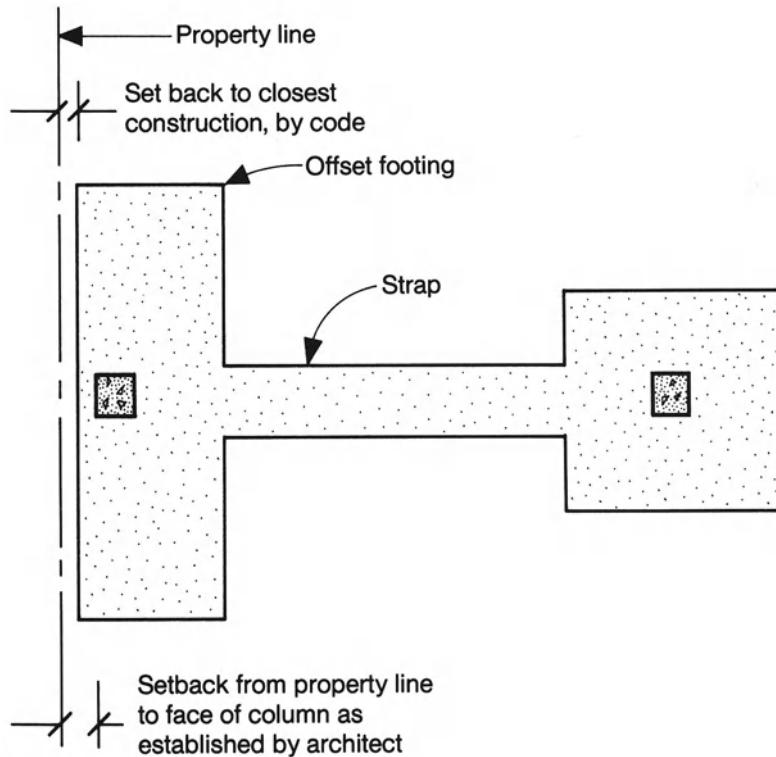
Strap footing solution to problem of column positioned adjacent to property line.
